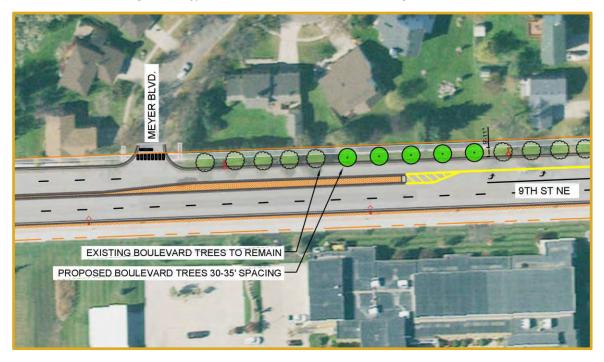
Typical 'on-fill' Street Trees between Existing Street Trees
